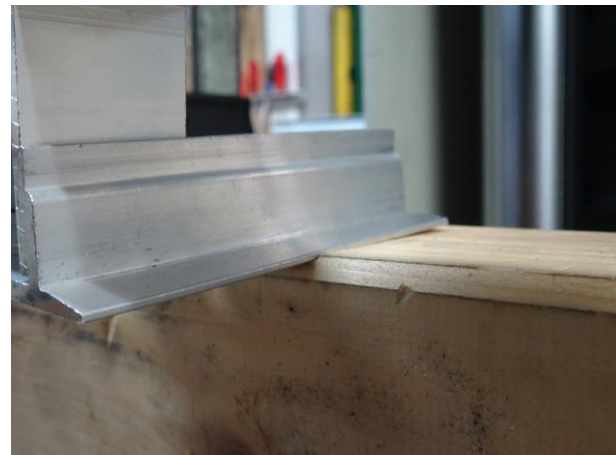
Bearing surface on wooden beam at 1,9 kN
